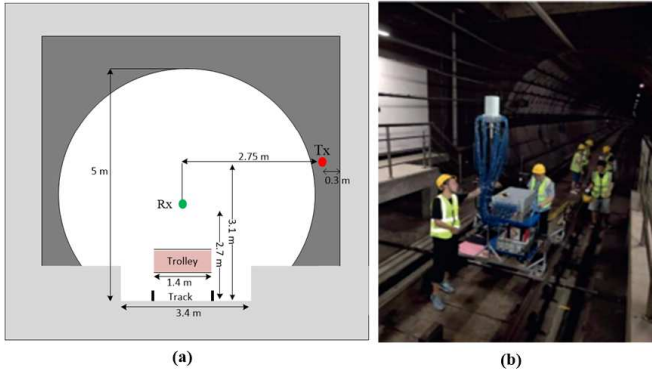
Measurement scenario, (a) Tunnel cross-sectional area, (b) Measurement campaign conducted in real tunnel environment.
